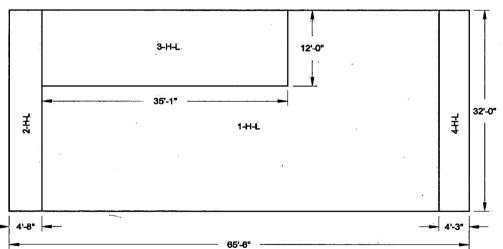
H.6-167: WALL 7 LOOKING FROM OUTSIDE TRANSVERSE REINFORCEMENT ZONES
